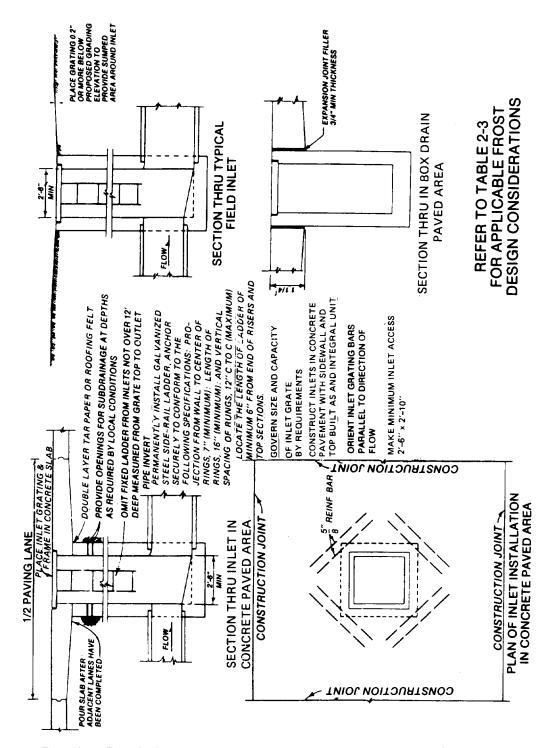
Typical inlet and box drain designs for airfield and heliport storm drainage systems.
